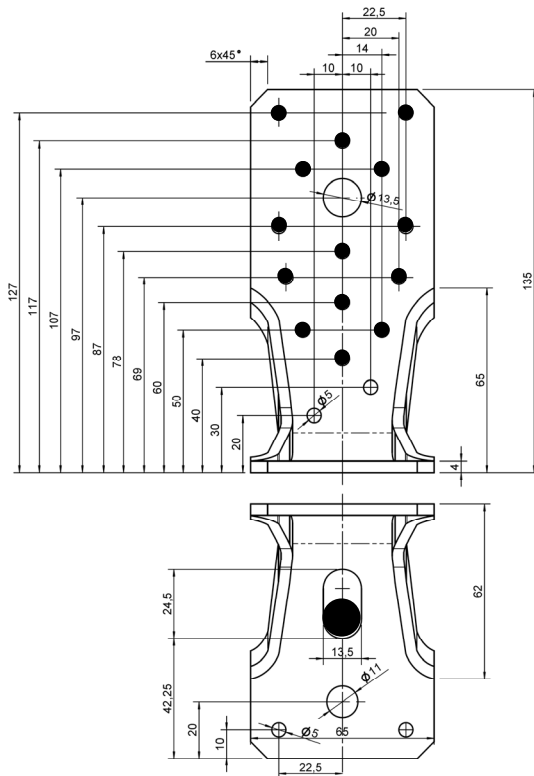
Nail Patterns of Angle Bracket KR 135 - purlin connection
